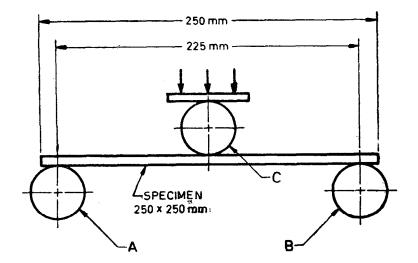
LOAD BEARING CAPACITY TEST FOR FLAT SHEETS AND BUILDING BOARDS
